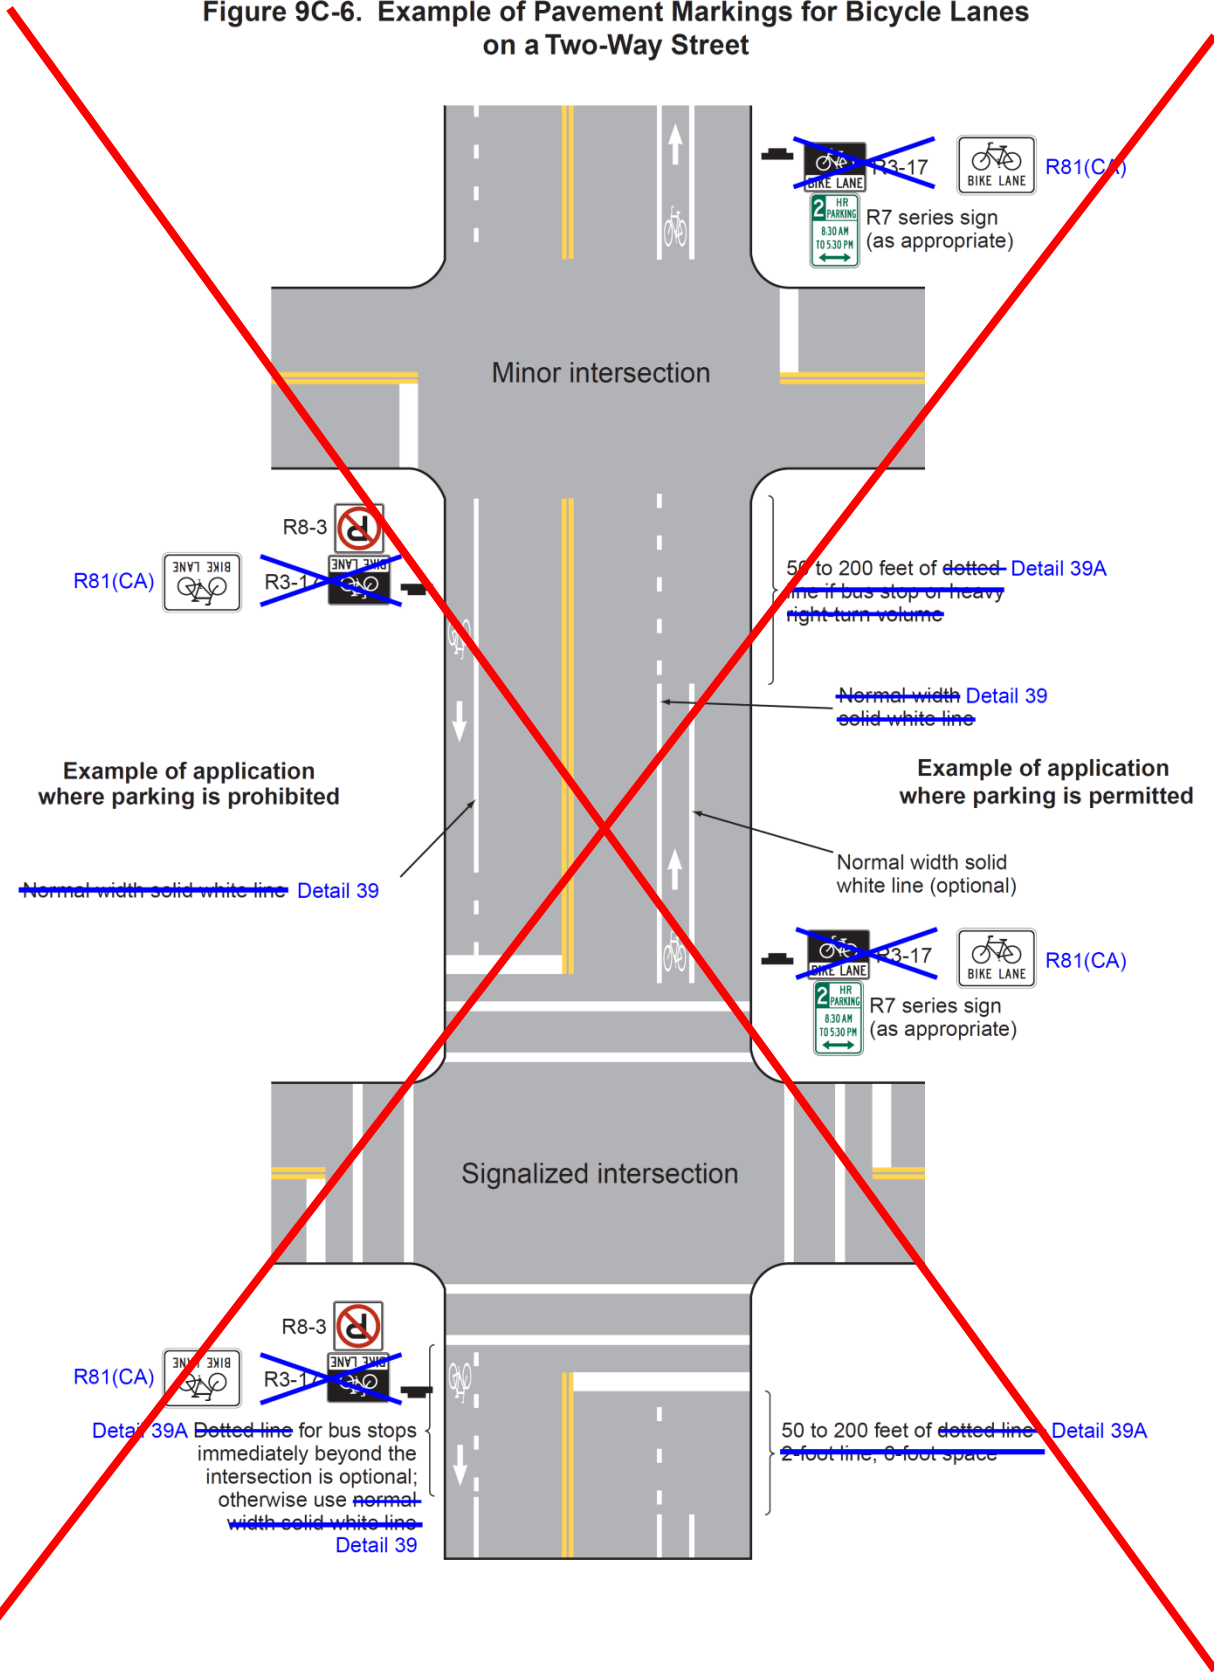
C-6. Example of Pavement Markings for Bicycle Lanes on a Two-Way Street
